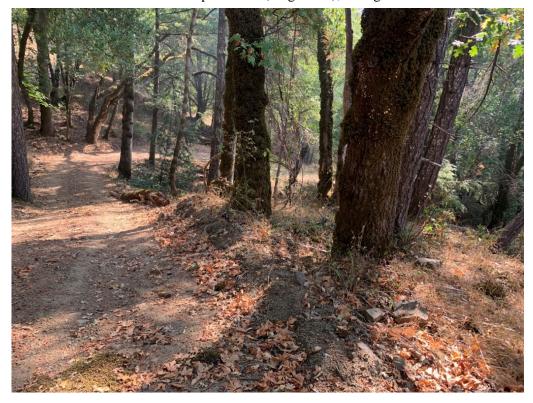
Road point # 10 (Flag #s 204 & 205), facing east.
